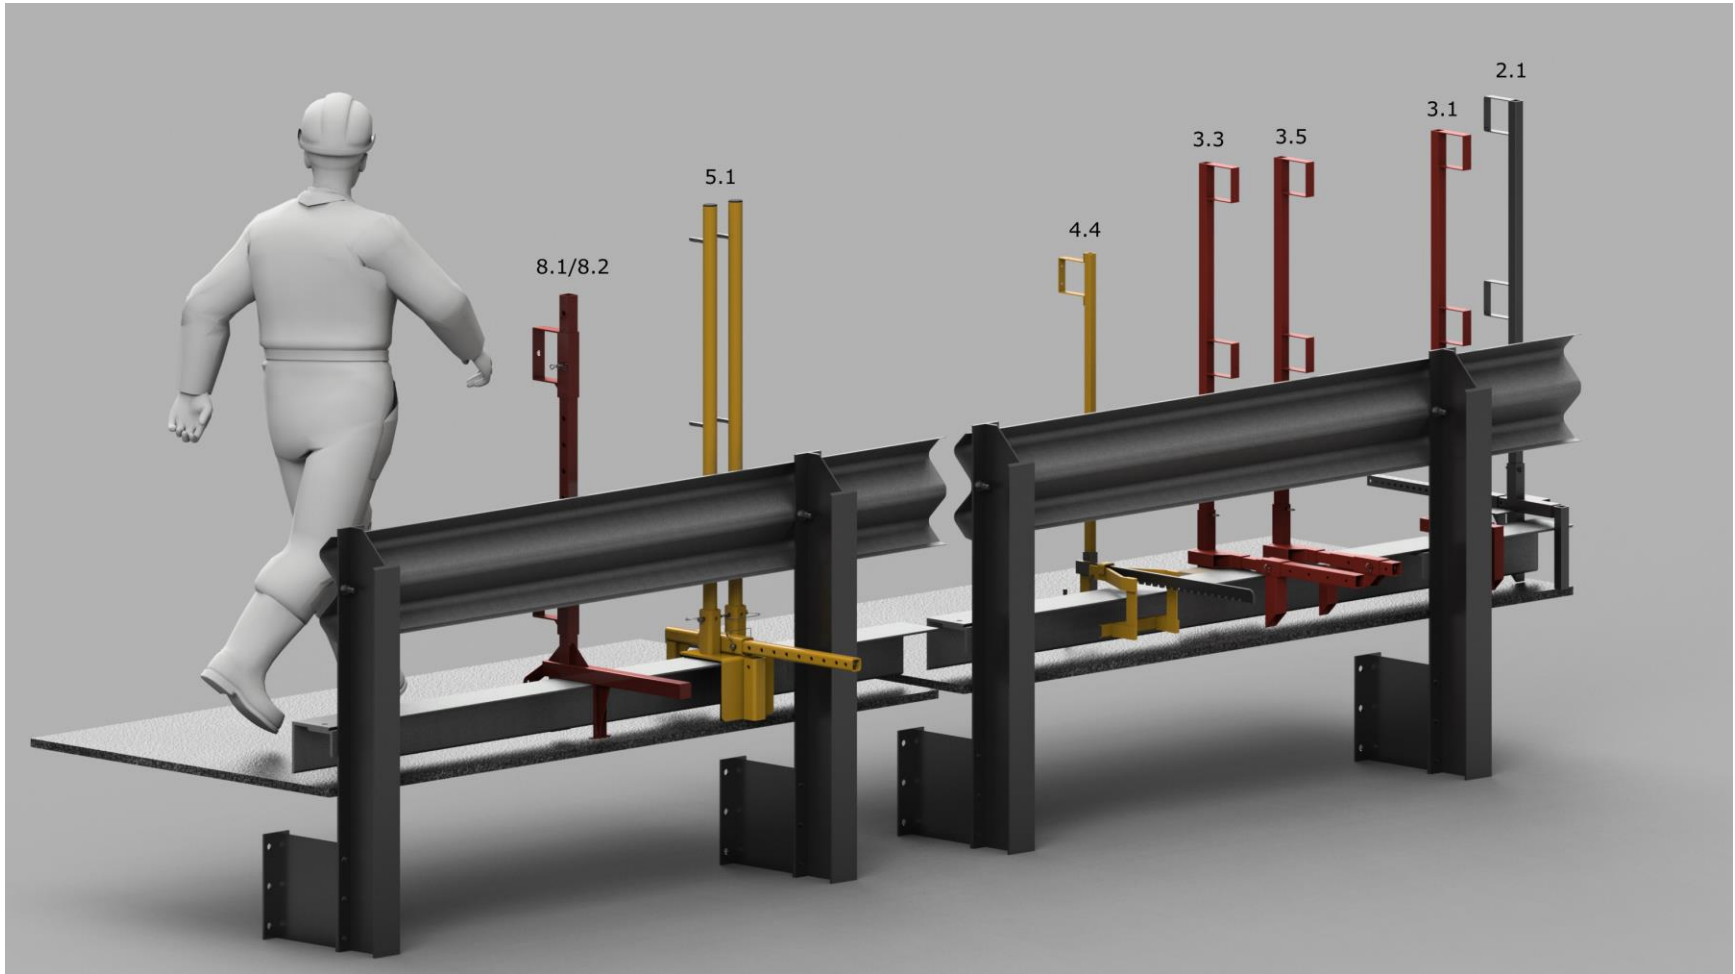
Guardrail Type 23, wheel guard fit; view from the northwest
